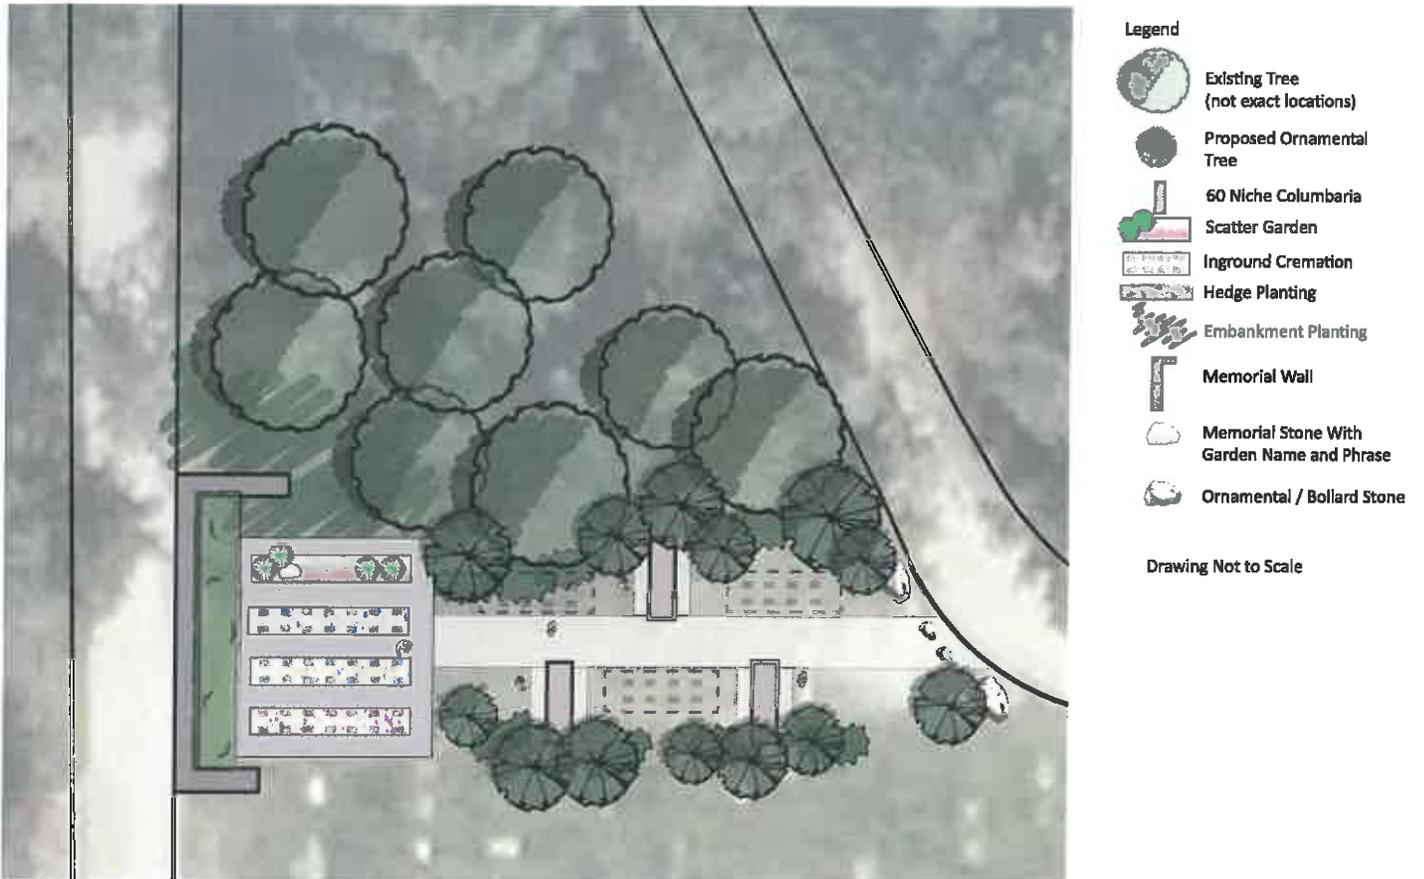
Memorial Wall and Upper Cremation Garden Schematic Plan, Not to Scale
